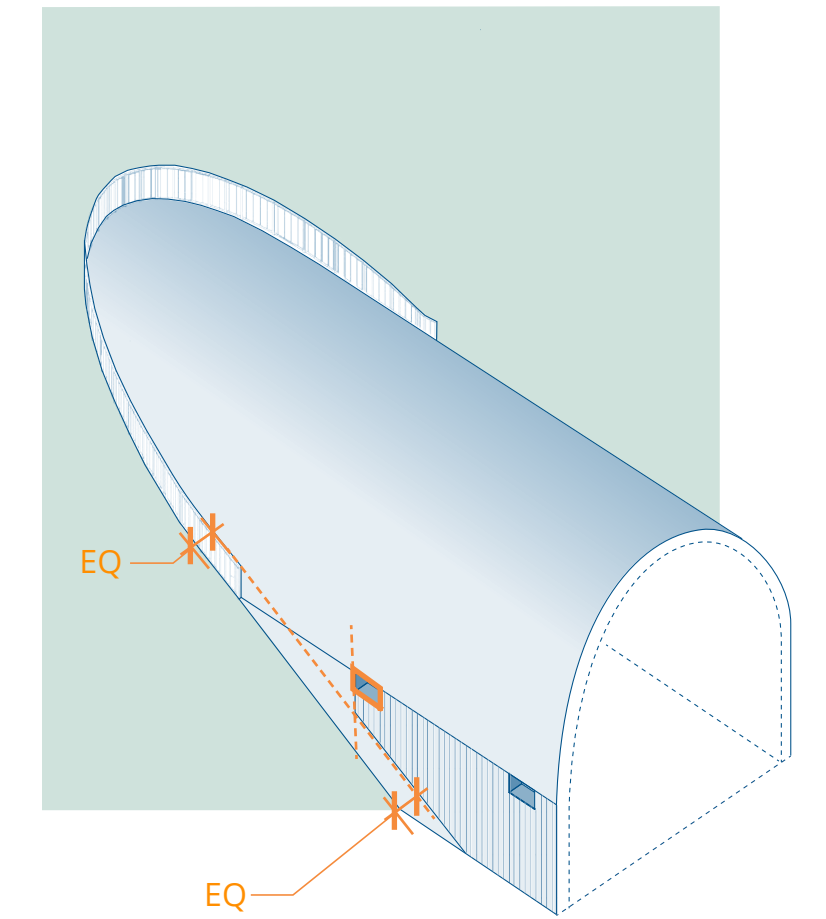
\_ Diagram - Portal headwall handrail and textured wall detail
